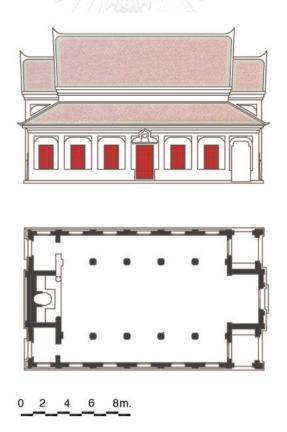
window and door panels are painted in red on the exterior wall of the ordination hall of Phra Pathommachedi Temple. Plan and elevations.
